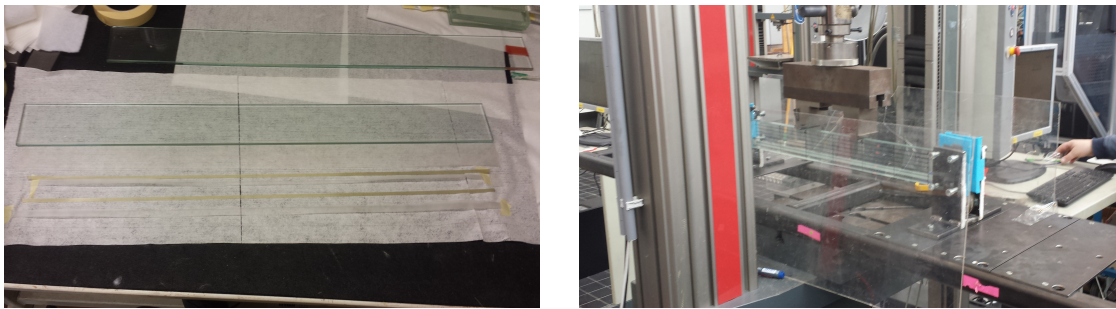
Assembling the parts of specimen BEN2-REF and test set-up
